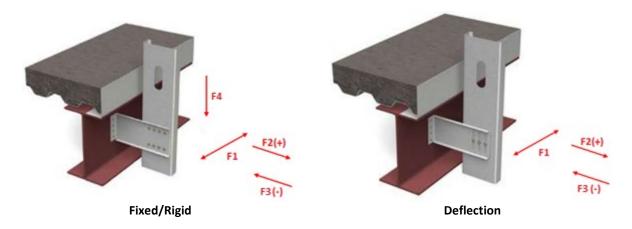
UBC TYPICAL INSTALLATION AND LOAD DIRECTION
